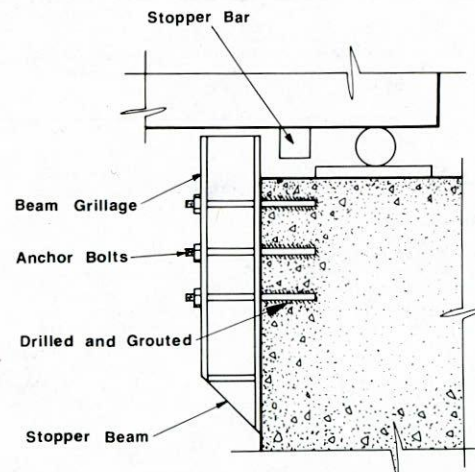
Longitudinal Motion Restrainer at an Abutment or Pier Bent
